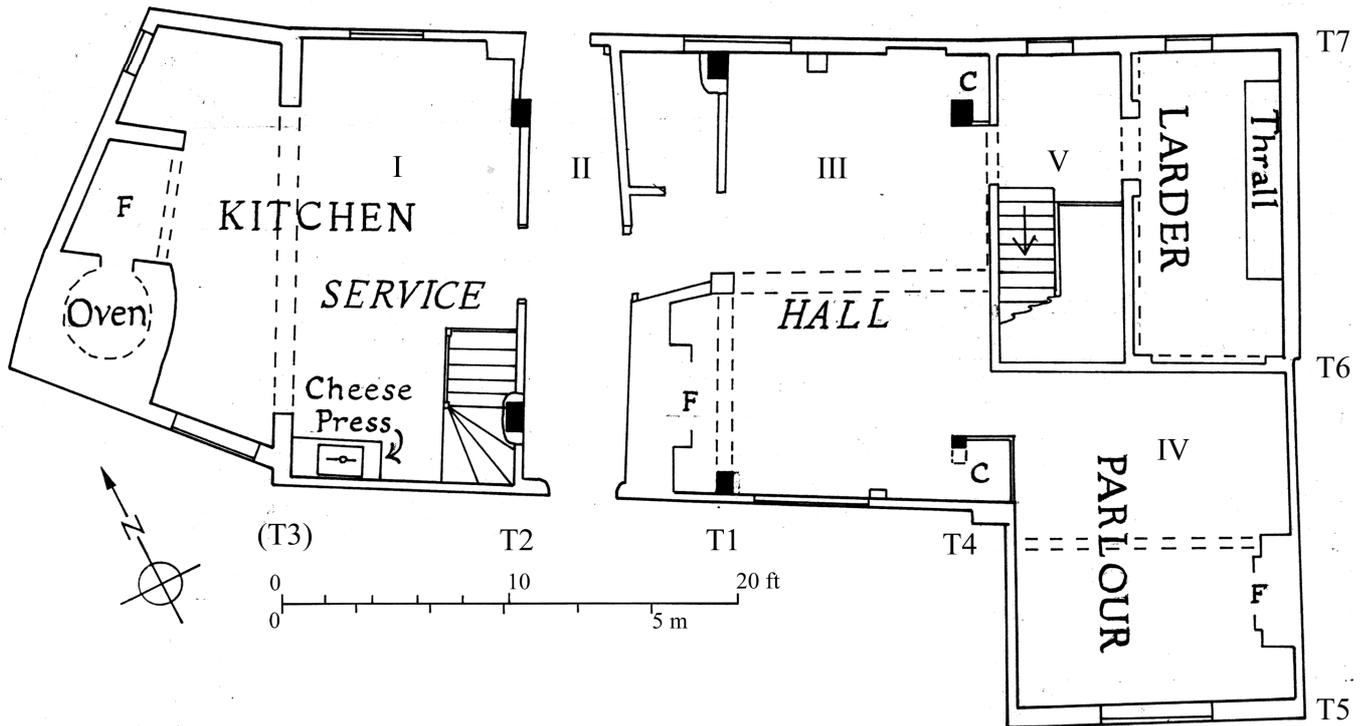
Plan, showing truss and bay numbering (from Barley (1961)).
